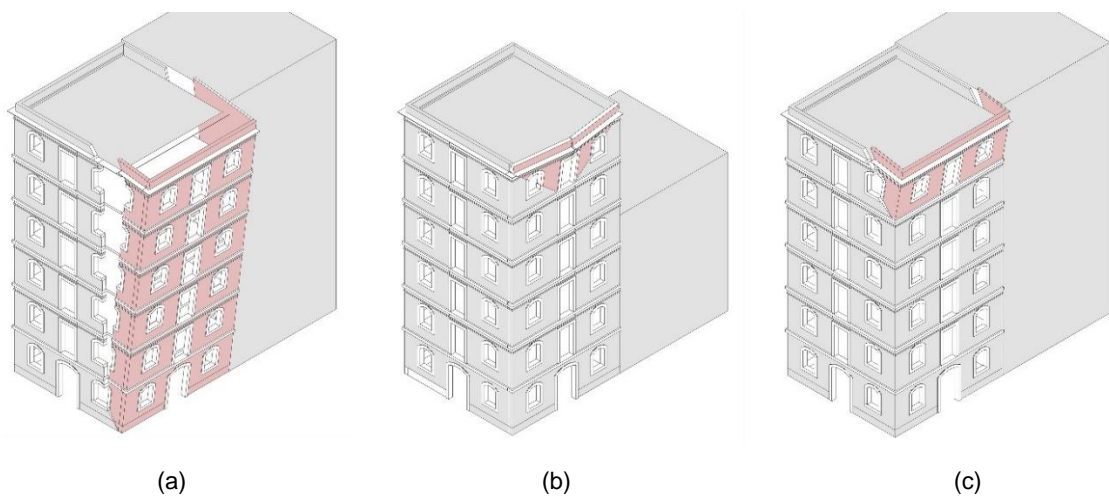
Local mechanisms: (a) Overturning of the facade with two side wings, (b) Overturning of the top story (horizontal arch-top strip), (c) Overturning of the last floor with two side wings
